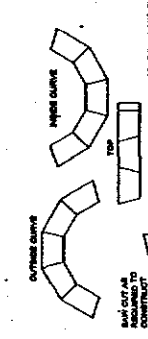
PLAN FOR CURVED WALL WITH REINFORCEMENT
